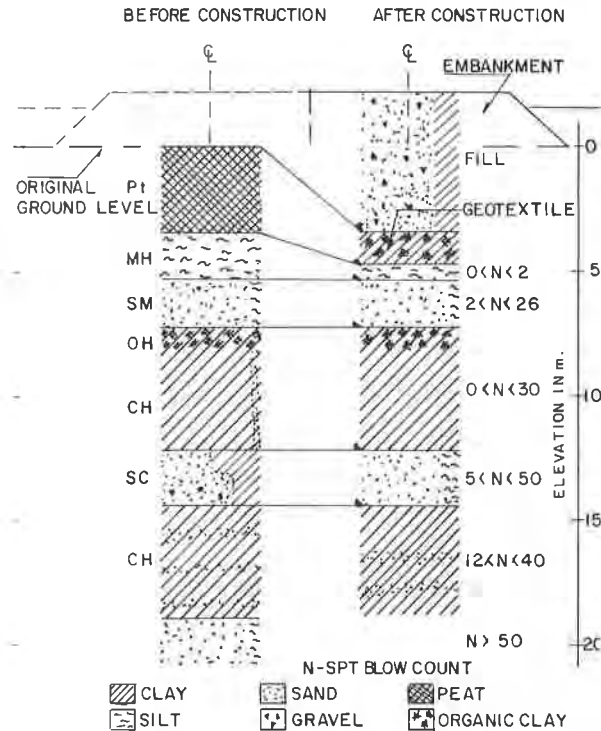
STRATIGRAPHIC COMPARISON BEFORE AND AFTER CONSTRUCTION OF THE HIGHWAY EMBANKMENT SECTION WITH GEOTEXTILE
